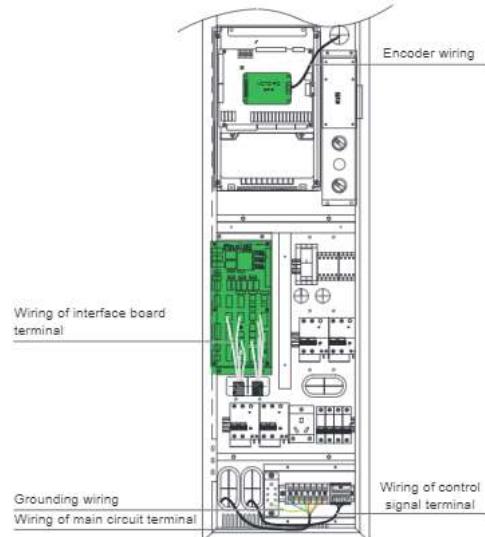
Wiring of external interfaces of machine-roomless control cabinet
